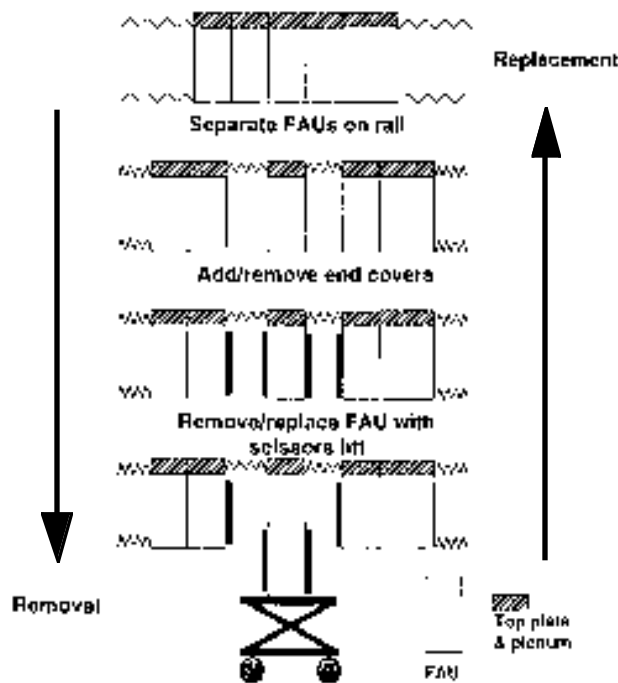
Large scissor lifts could be used to install and remove frame assembly units.
